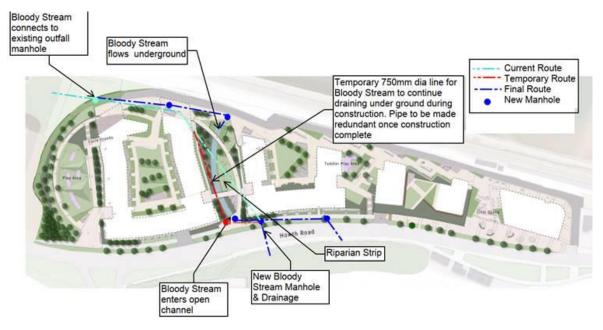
Bloody Stream Temporary Diversion Riparian Strip Plan and Sections
